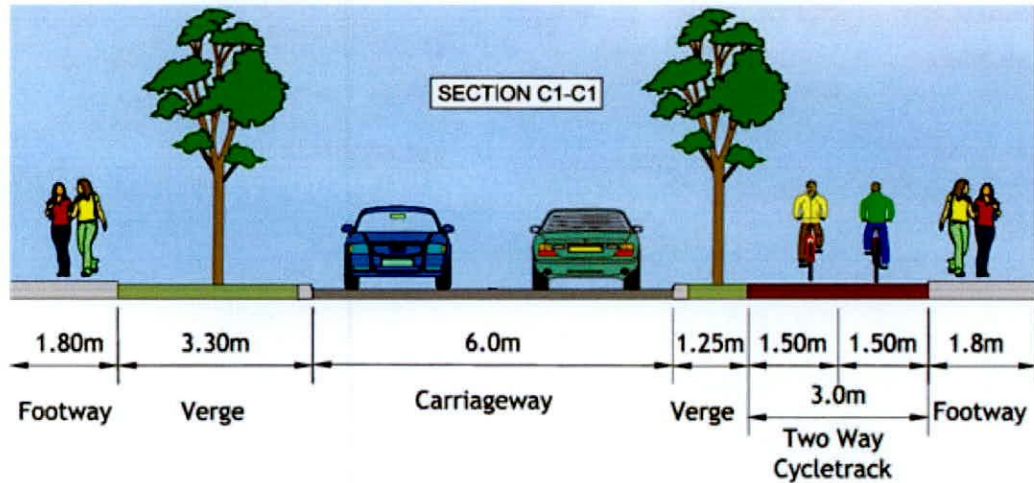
Street Geometry : Office Park's East-West Aligned Access Road
